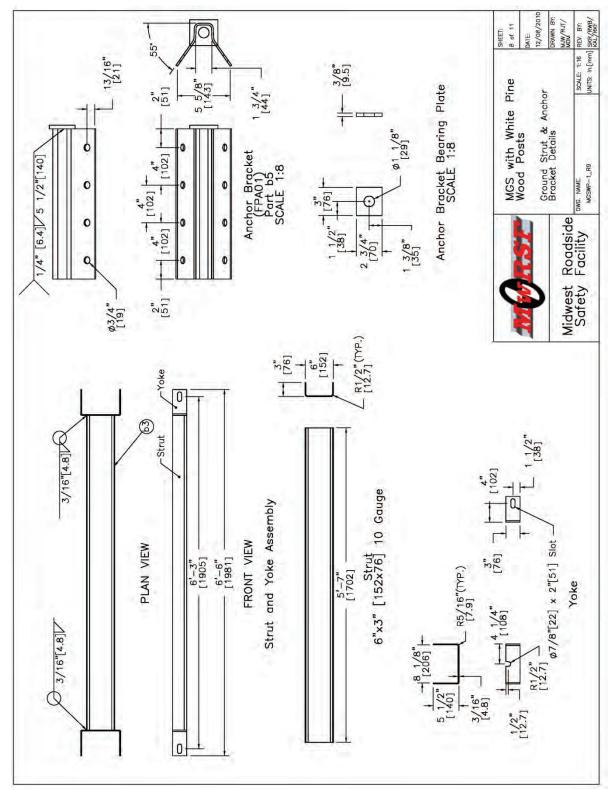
Ground Strut and Anchor Bracket Details, Test No. MGSWP-1
